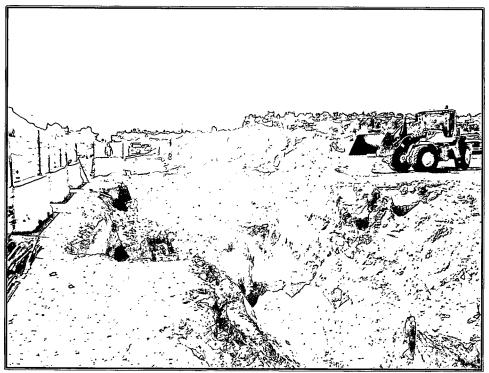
Backfilling of the south portion of the Lateral C-7 Pipeline excavation.
